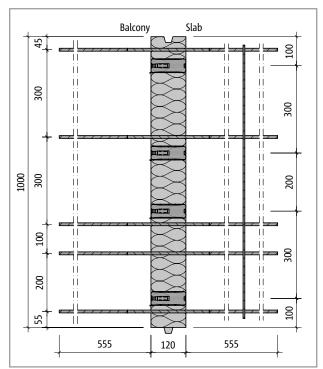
Schöck Isokorb® XT type Q-V1: Product plan view
